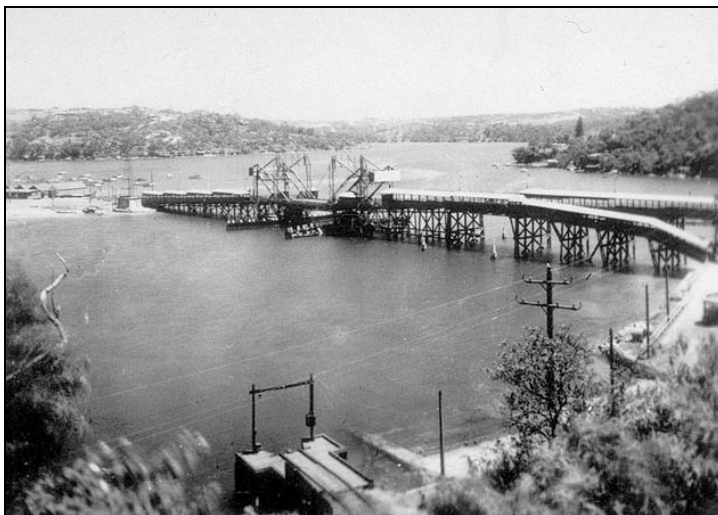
The first Spit Bridge, showing the timber pile and brace construction.
